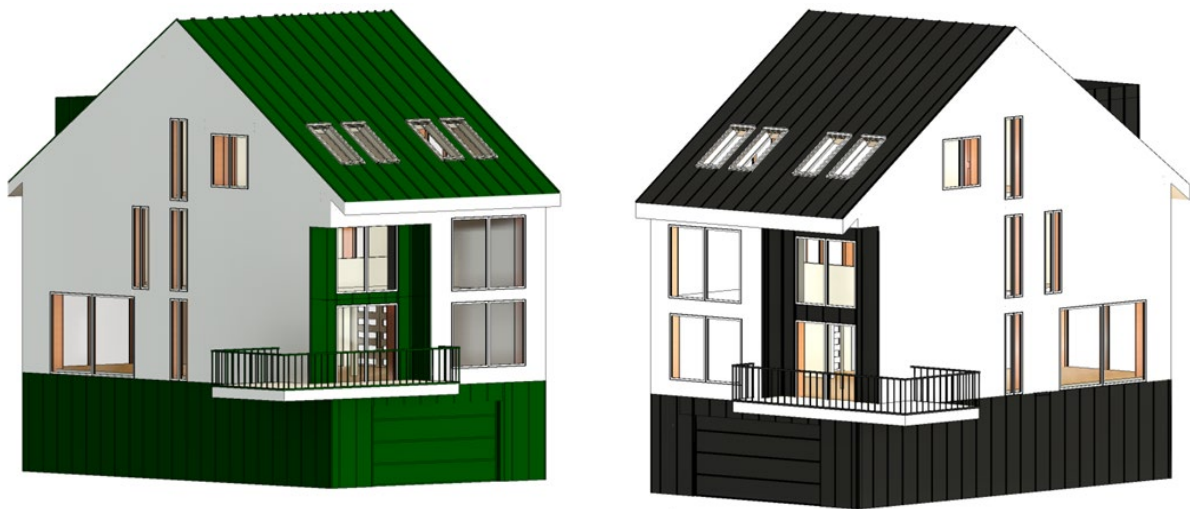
The BIM model of the concrete (left) and the timber (right) building.
